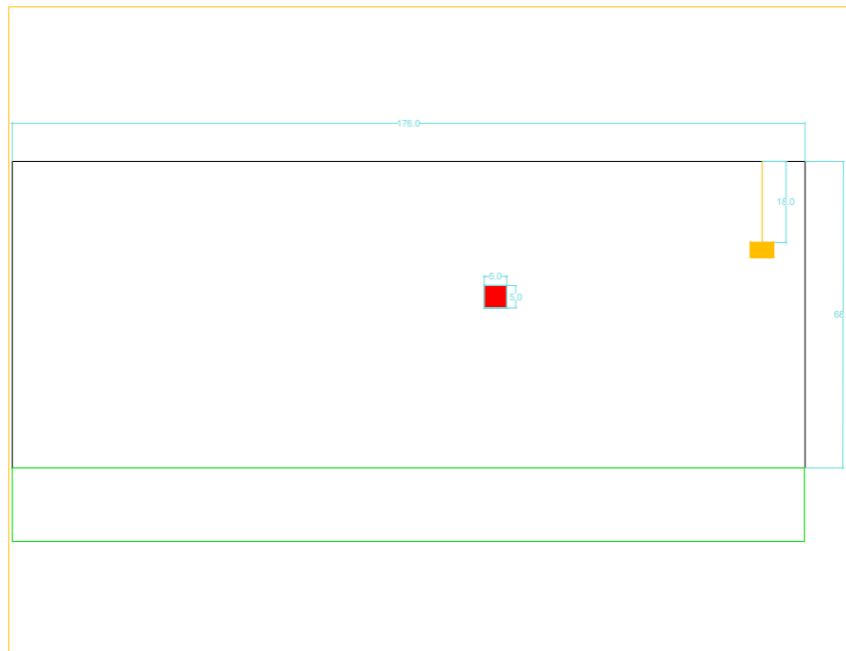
AutoCAD Drawing of the Dimensions of the Wall (Generated by Anissa Stull)
